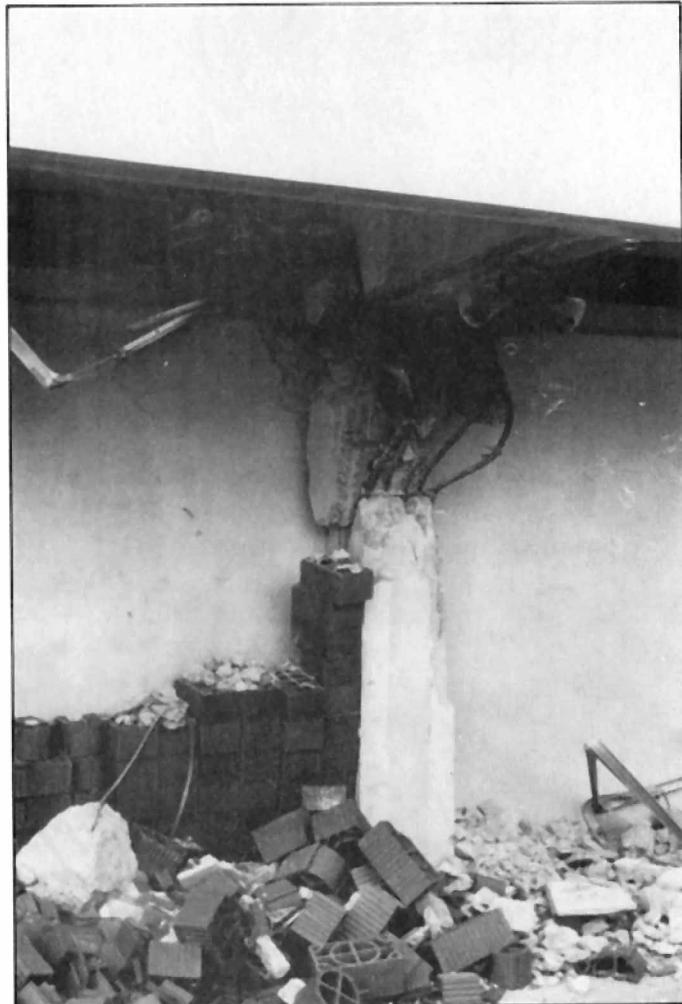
COLUMN FAILURE AT HOSPITAL BENJAMIN BLOOM.
